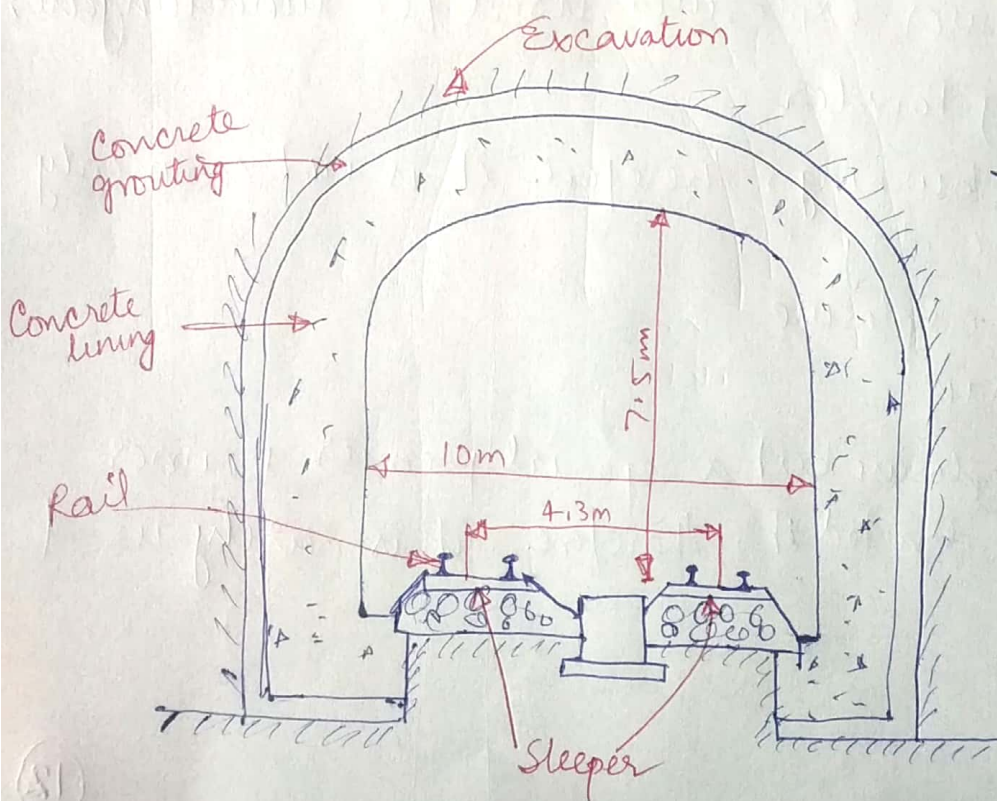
Cross-section of tunnel for a double line broad gauge railway track.
